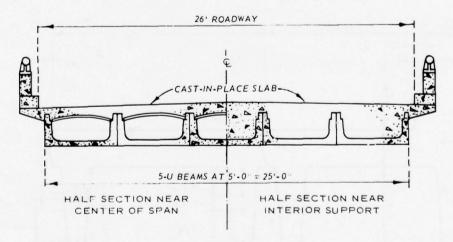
Typical cross section of the composite U-beam bridge deck (from Reference 10)
